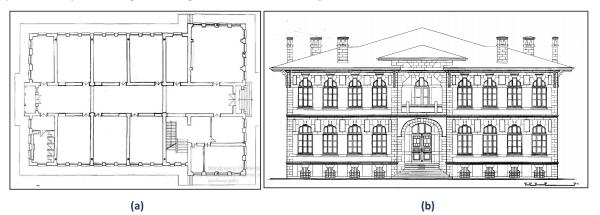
a) Girls' Teacher Training School ground floor plan (Kız öğretmen okulu | Tarihi evler, Fotoğraf, Bina, n.d.) b) Girls' Teacher Training School entrance facade (Sözen & Dülgerler, 1978)
